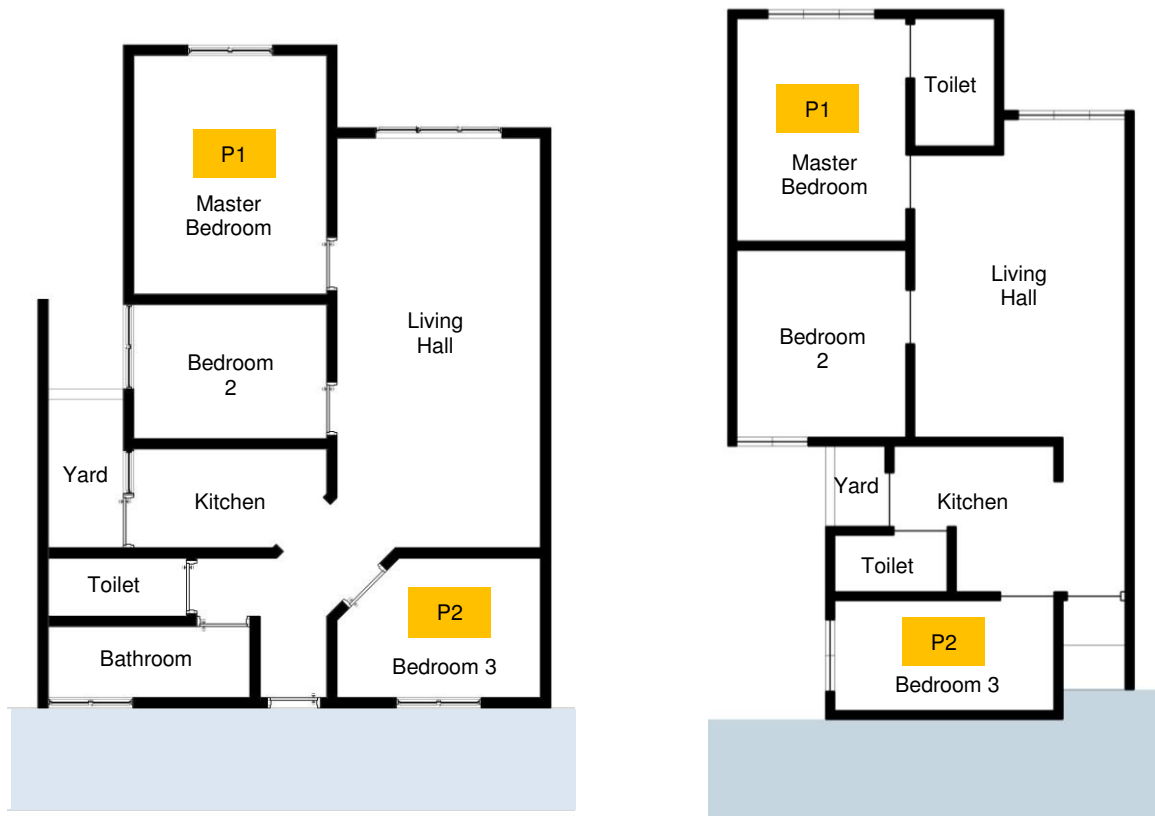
Typical Unit Layouts for PPR Beringin & PPR Seri Aman and location of the equipment (P1 and P2)
